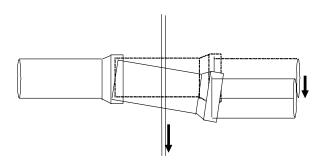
Pipe Joint Deformation at Fault Crossing
